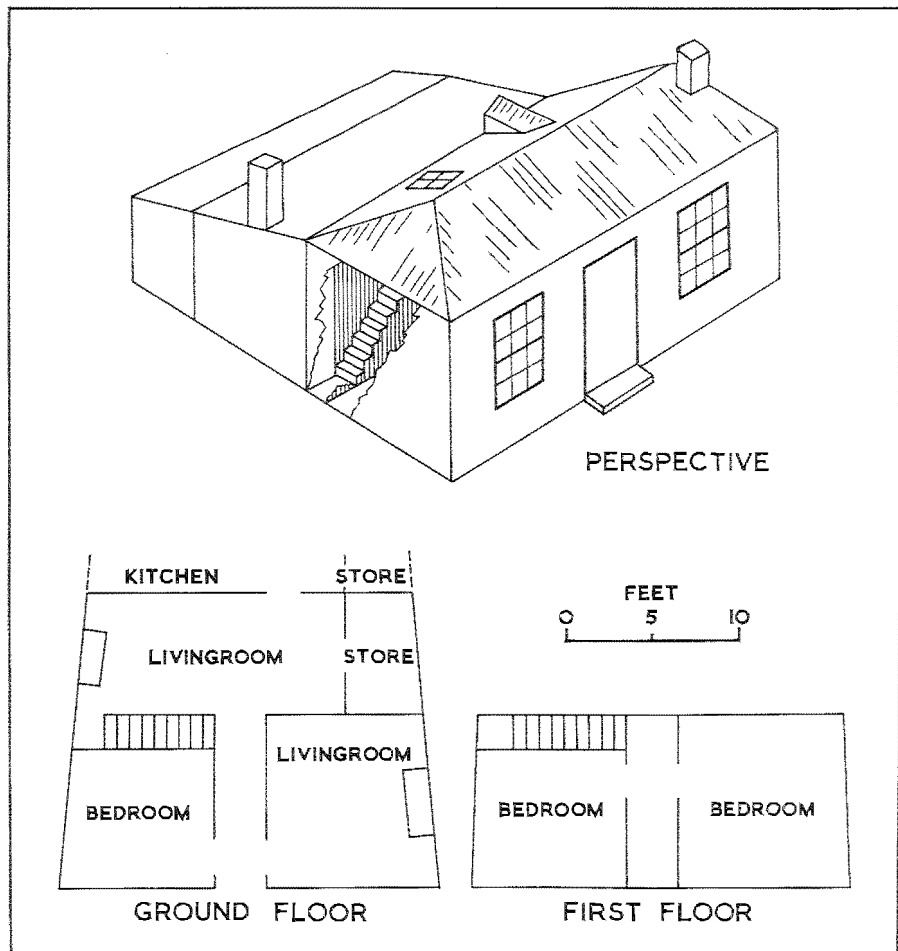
Plan and elevation of more typically-sized colonial cottage, Murray Street, North Hobart. Two attic bedrooms not apparent from street.
